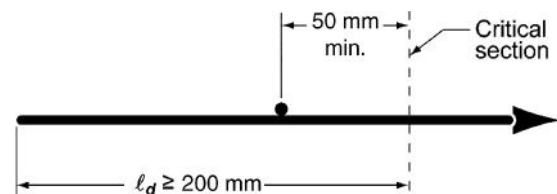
Development of welded deformed wire reinforcement.
